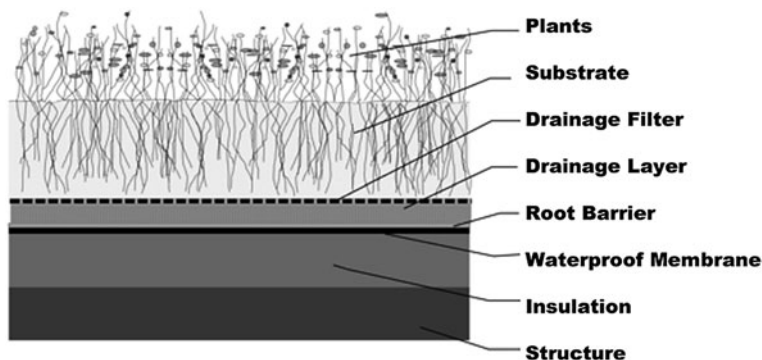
A typical green roof cross-section shown above with its multiple layers
